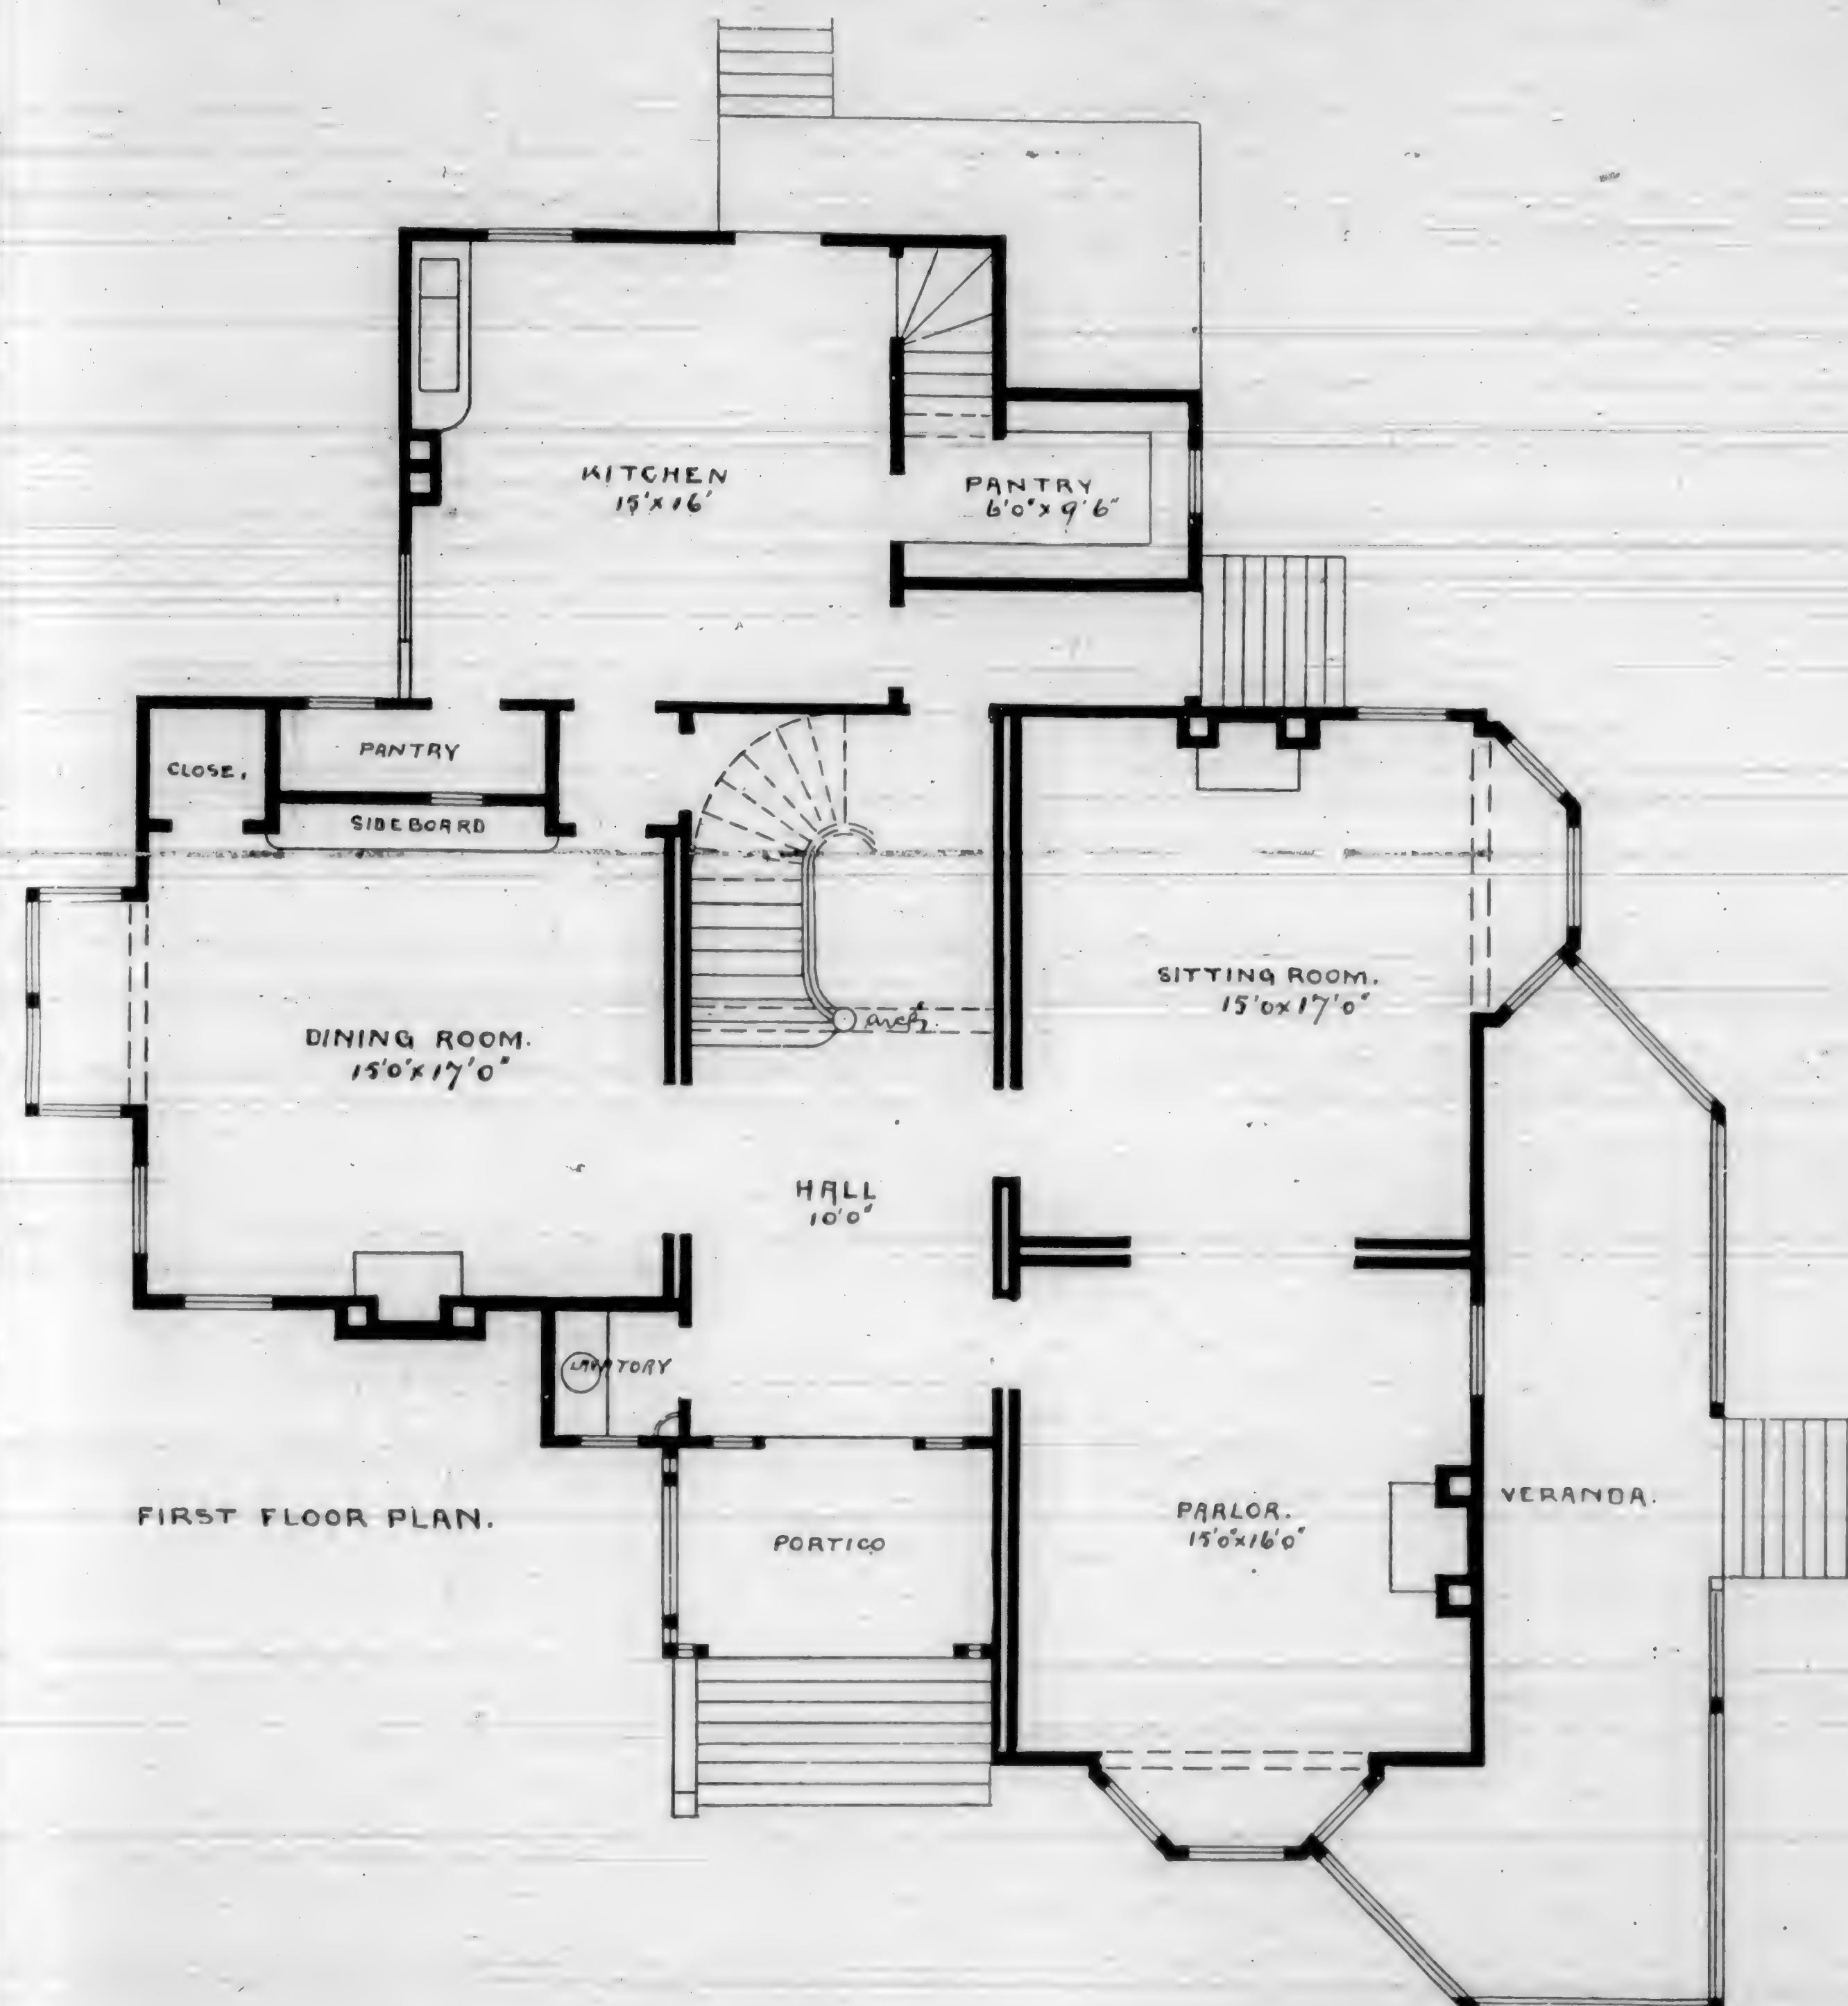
FIRST FLOOR PLAN COMMODIOUS COUNTRY DWELLING.
